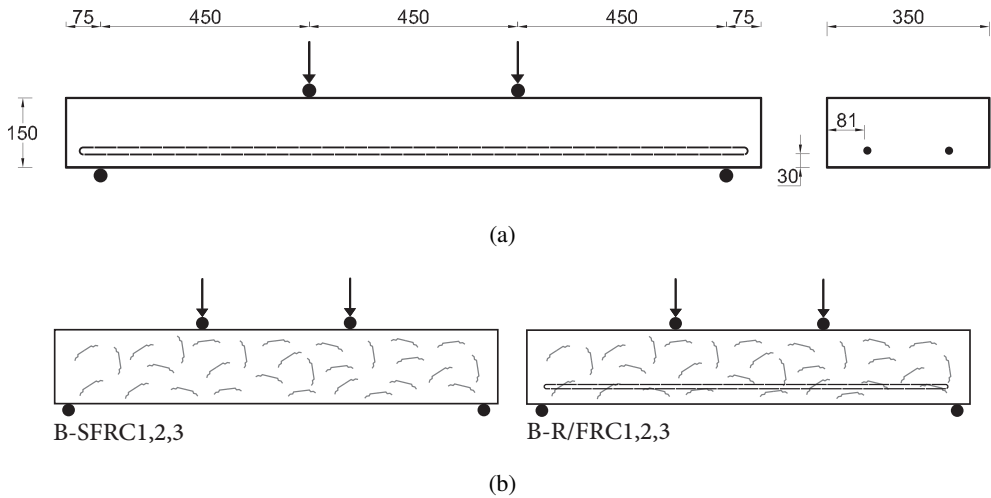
(a) The dimensions of the shallow beams and the loading condition (b) three SFRC (B-SFRC) and three R/FRC (B-R/FRC) beams were tested.
